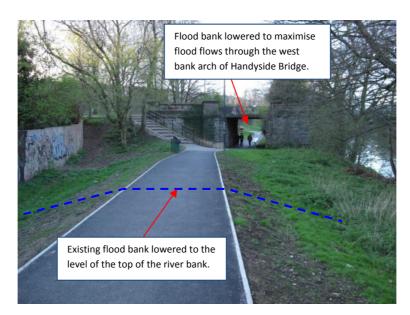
Existing flood bank lowered downstream of Handyside Bridge
